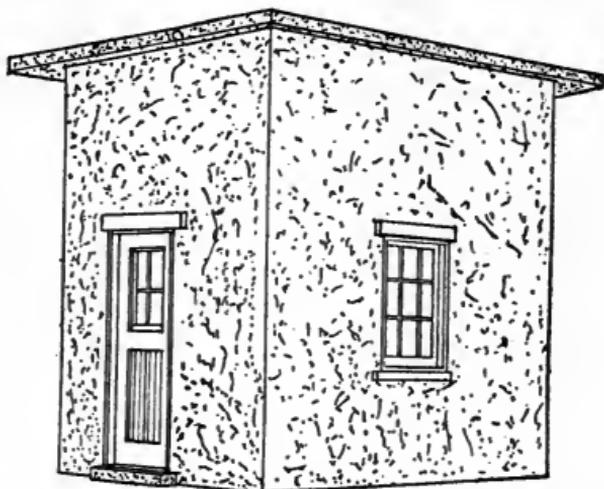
Perspective View of a Reinforced Concrete Dairy House with Water Tank in the Top
